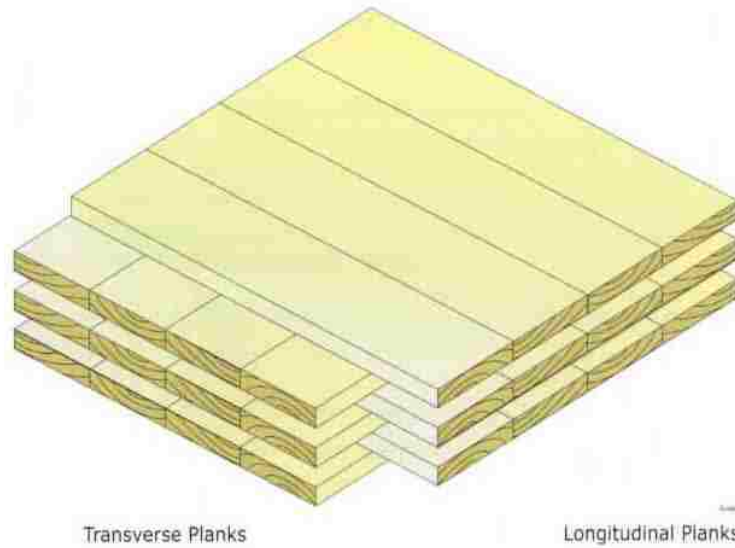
Layout of Individual Boards to Form CLT Panels, (FPInnovations 2011)
